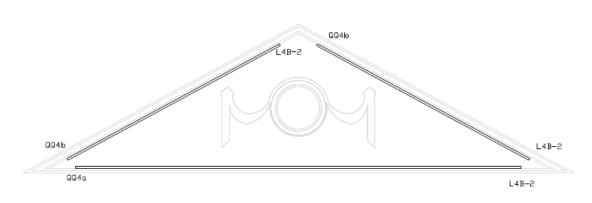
Pediment Lighting Layout – Fixture QQ4
